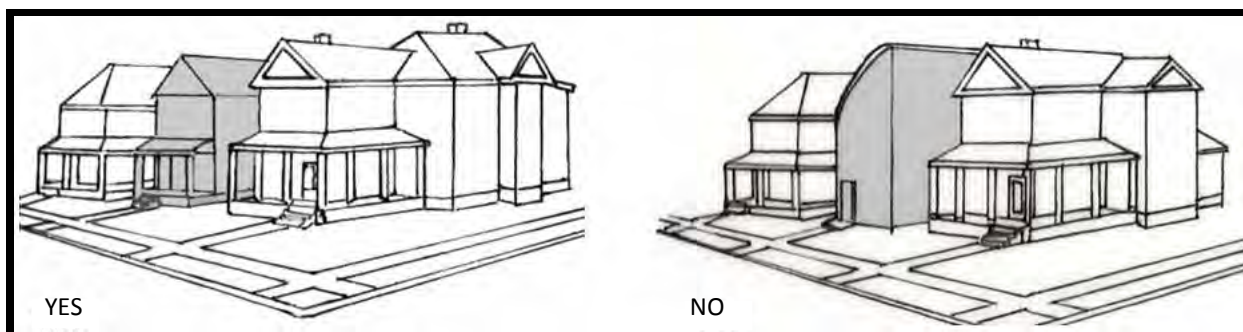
NEW CONSTRUCTION SHOULD BE CONSISTENT WITH THE PREDOMINANT SHAPES AND ROOF FORMS ON THE BLOCK WHERE THE NEW BUILDING IS LOCATED.
